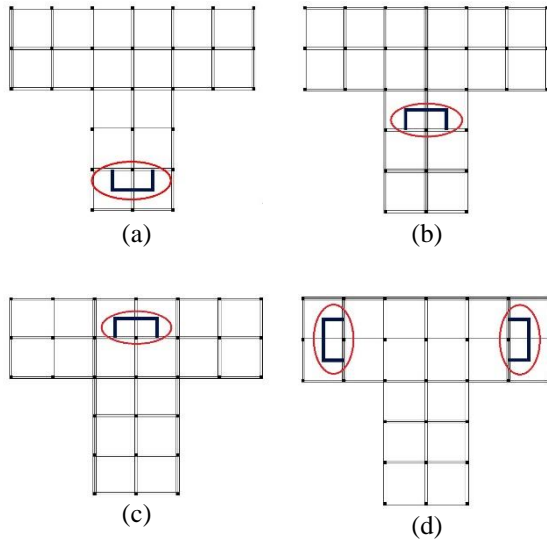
Typical plan view of T-shape building model showing shear wall position at (a) bottom wing, single (B-SGL); (b) center, single (C-SGL); (c) top, single (T-SGL) and (d) top wing at both ends (T-DBL).
